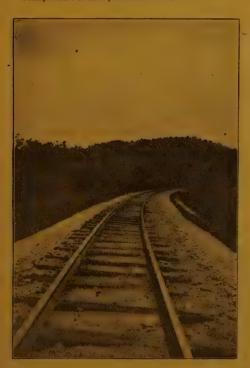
T. P. 225/17 maine line between Kuang and Rawang, 4° curve staggered joints, 80 lb. rails, 32 inch angle plates, sand and stone ballast, expansion moderate. Note improvement due to staggering.
